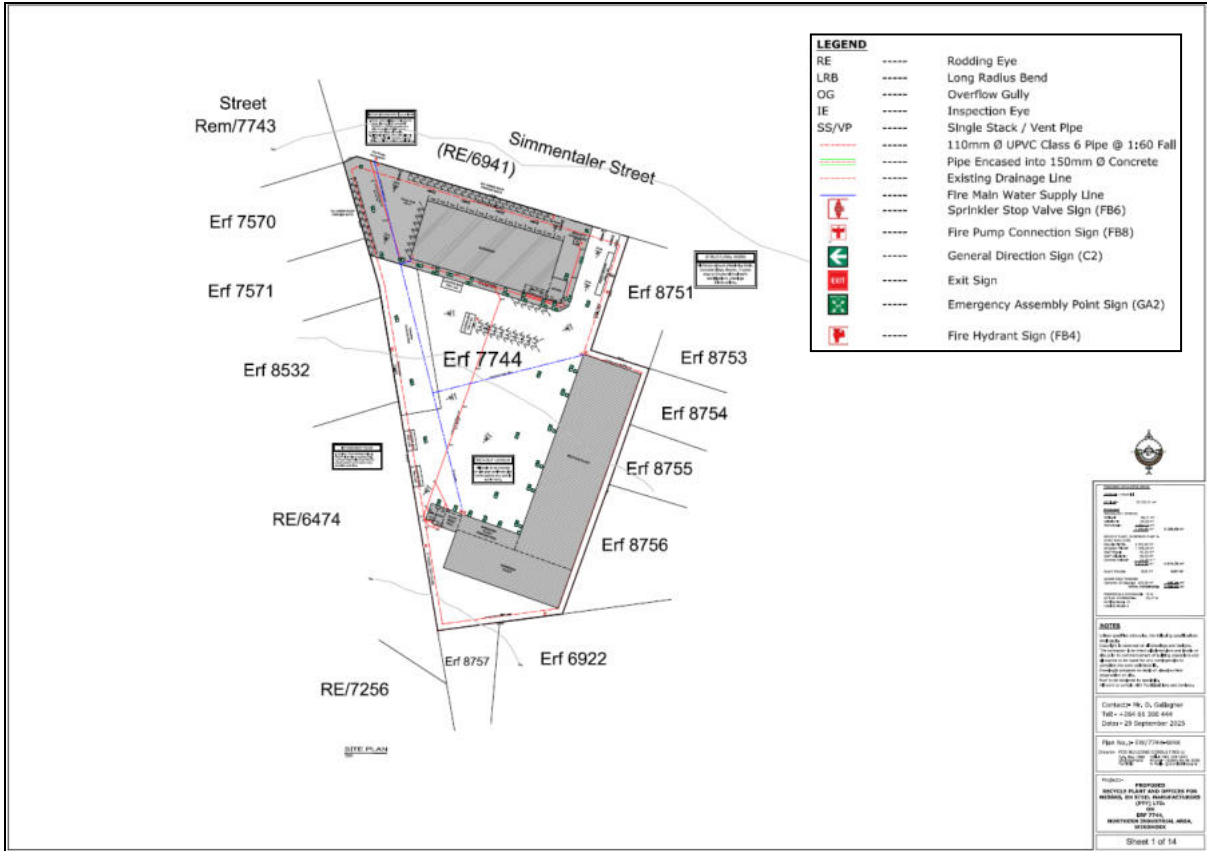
Site Layout Plan showing the placement of buildings and infrastructure
